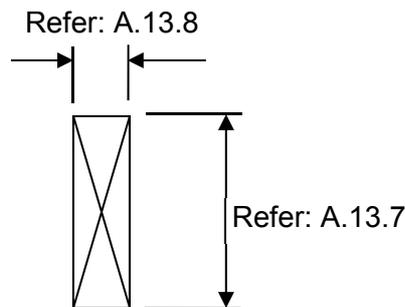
TYPICAL SHEETING DIMENSIONS
